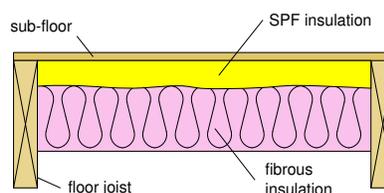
HYBRID INSULATION FLOOR DESIGN—ELEVATION SECTION VIEW
